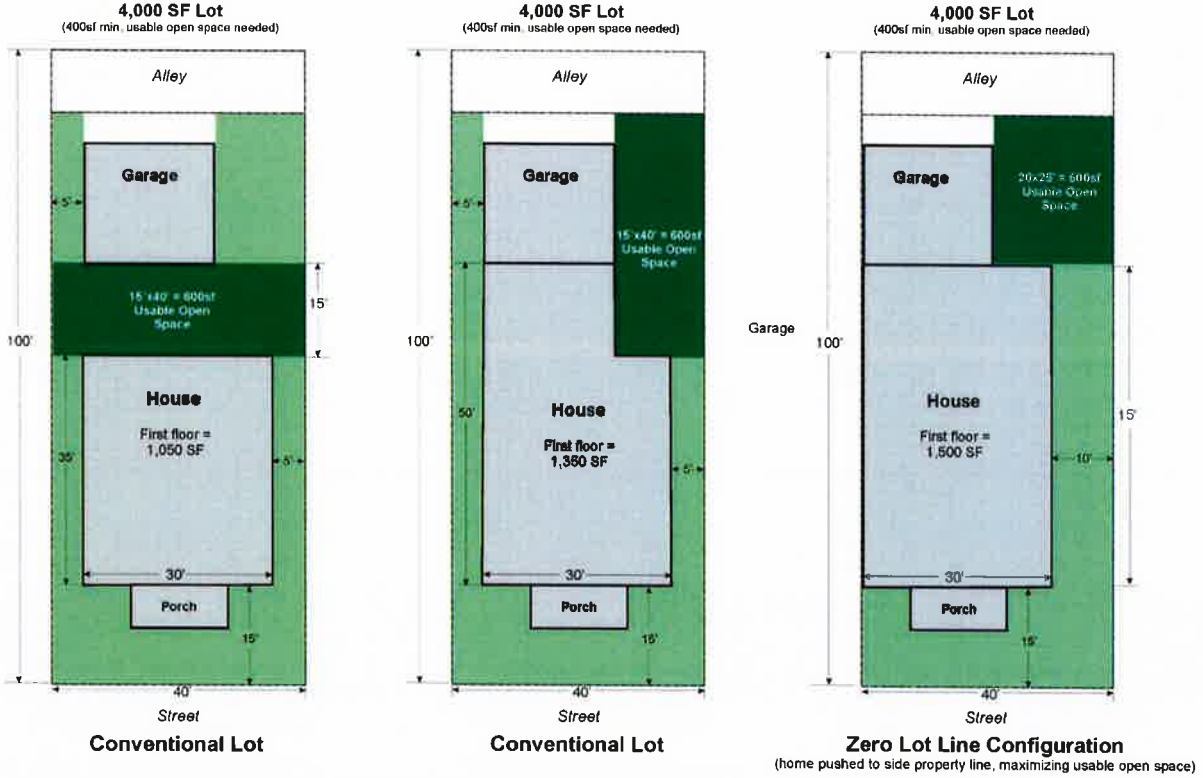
Examples of how usable open space can be configured on small lots. Note how zero lot line configuration (right) allows for a larger open space than in the conventional house layout (middle example) for 4,000 square foot lots.
